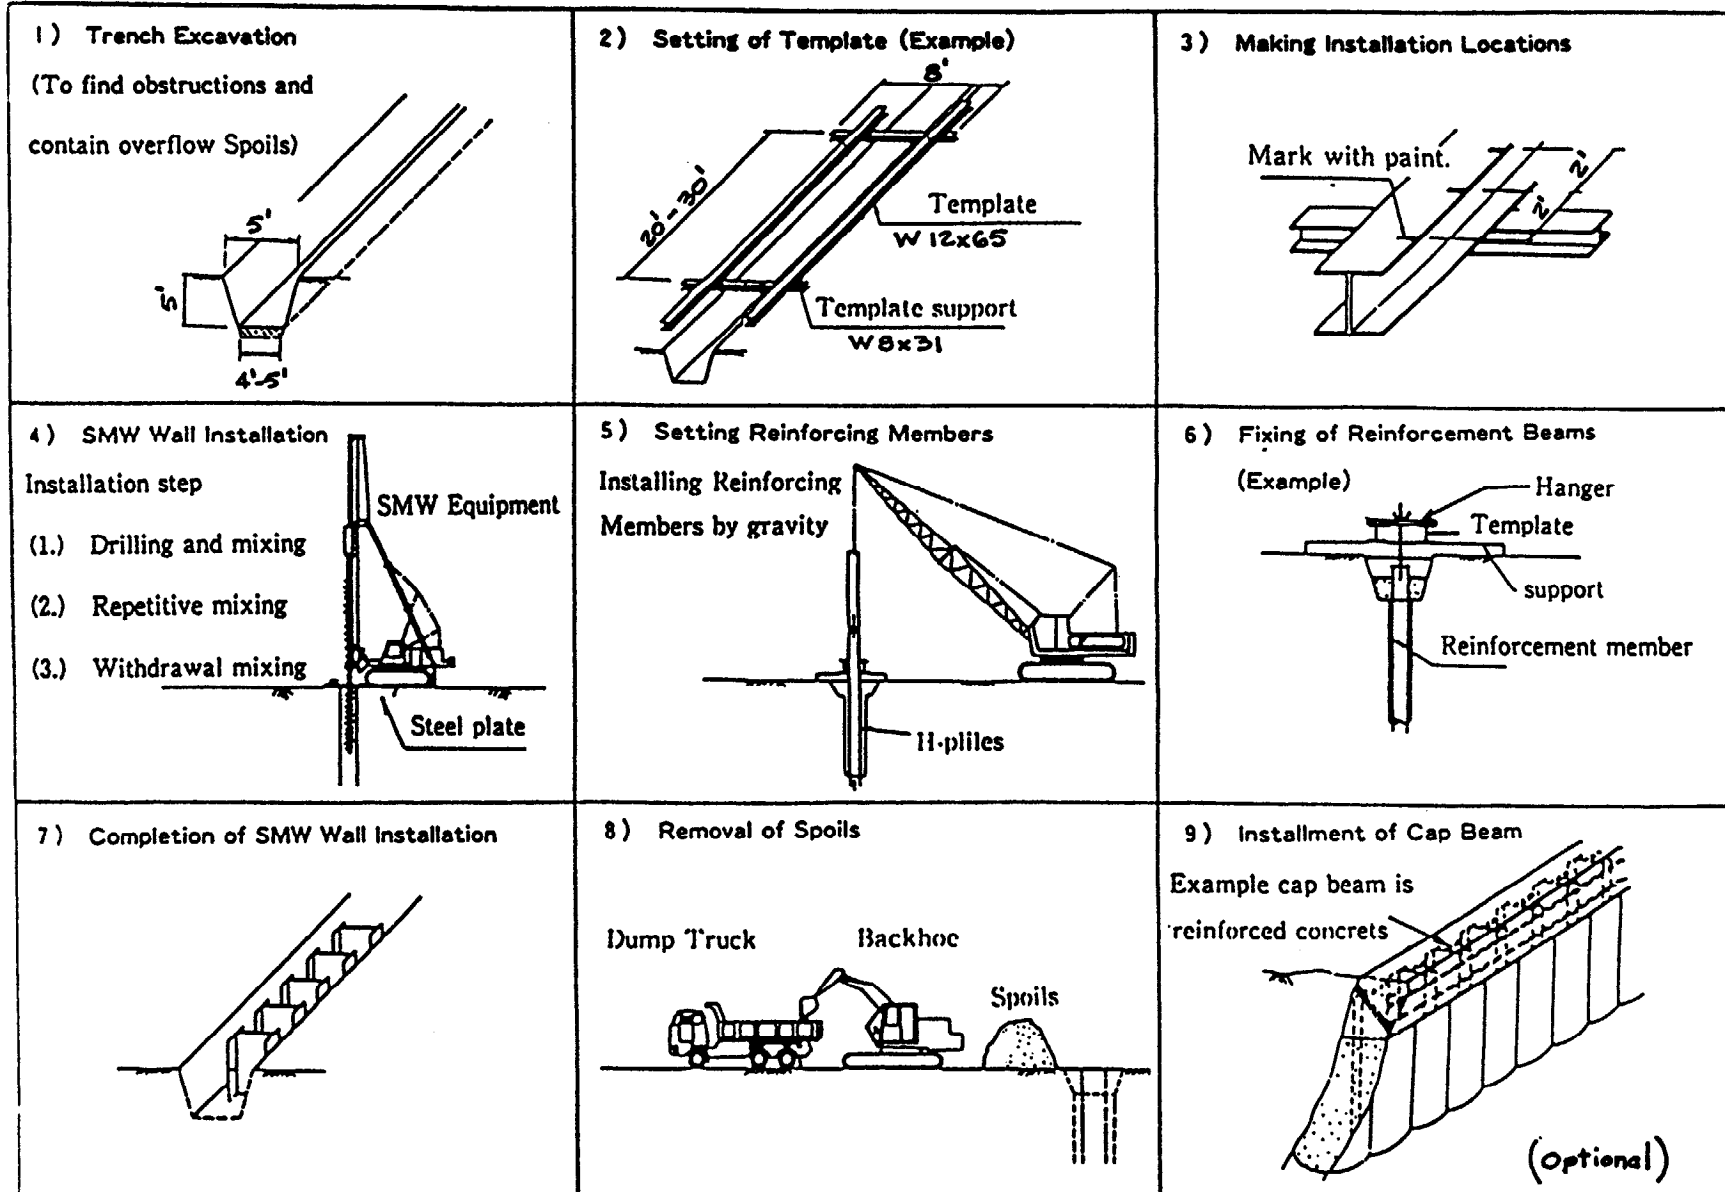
Construction steps for DMM used to create excavation support (Pearlman and Himick, 1993).
